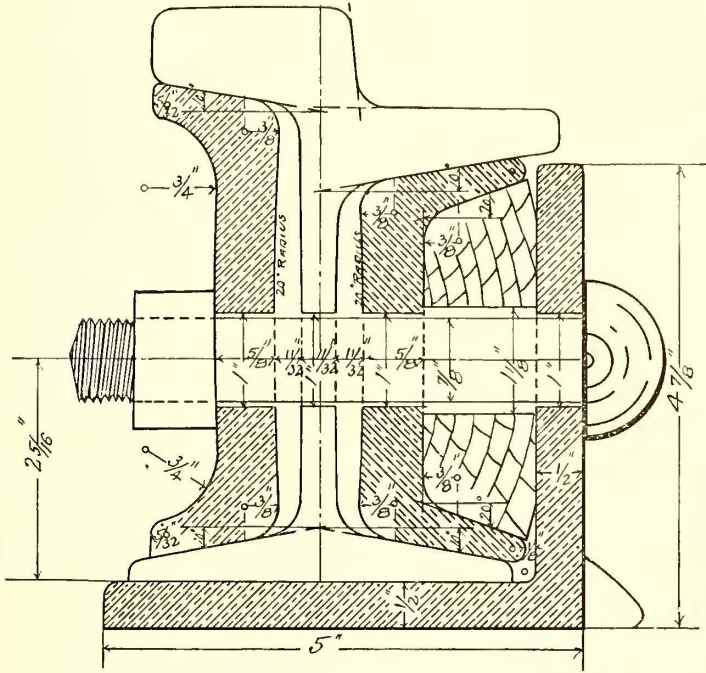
THE WEBER JOINT FOR 6 IN, GIRDER RAIL.
